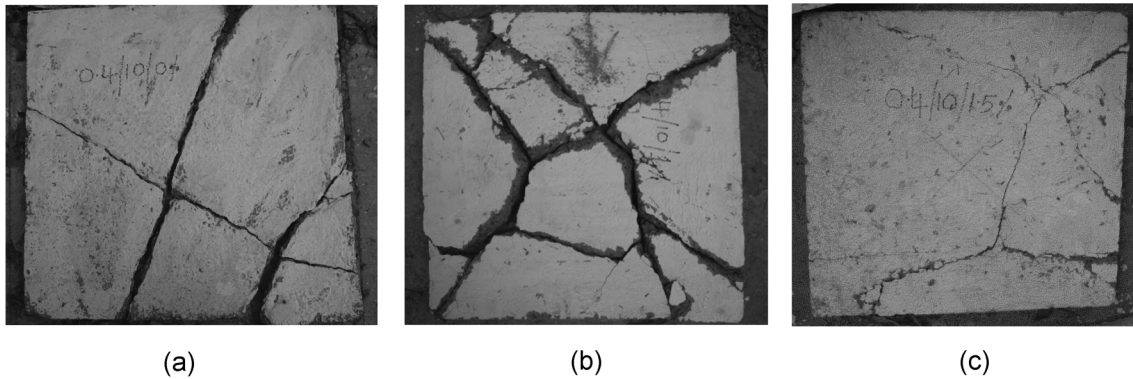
(a) Fracture pattern of test specimen after ultimate failure (Plate A1), (b) Fracture pattern of test specimen after ultimate failure (Plate A2), (c) Fracture pattern of test specimen after ultimate failure (Plate A3)
